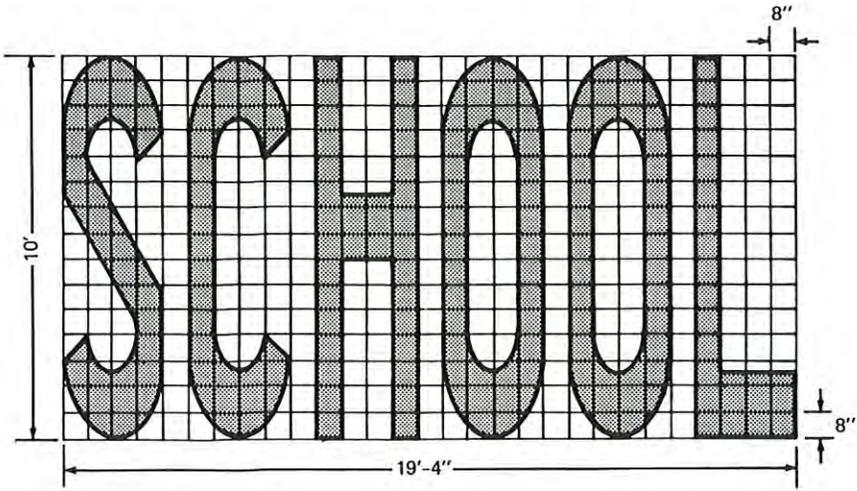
Two-lane pavement marking—detail of word "SCHOOL".
